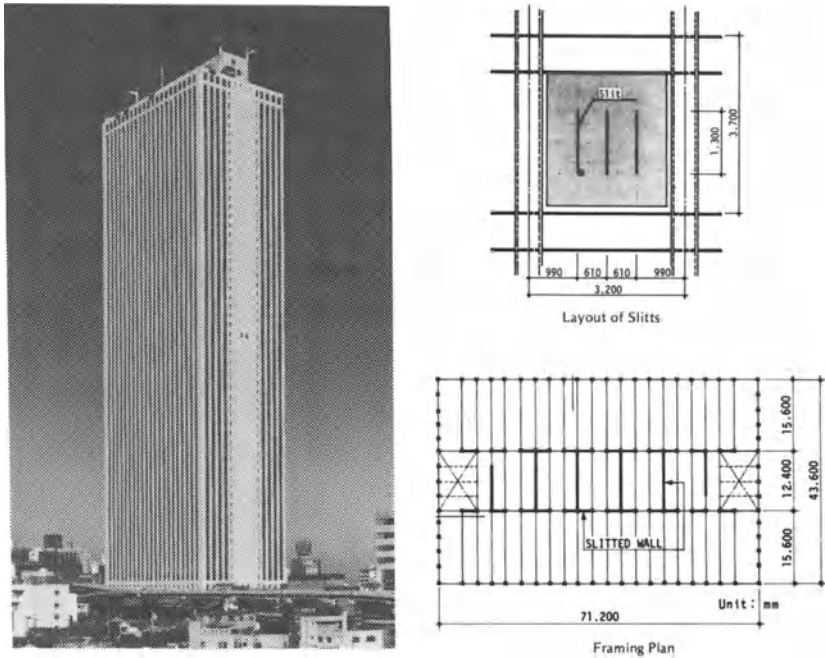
60-story Ikebukuro Building, Tokyo (1976). Moment-resisting perimeter framing is stiffened with slitted walls (Courtesy: Kajima Corporation and Muto Institute of Structural Mechanics.)
